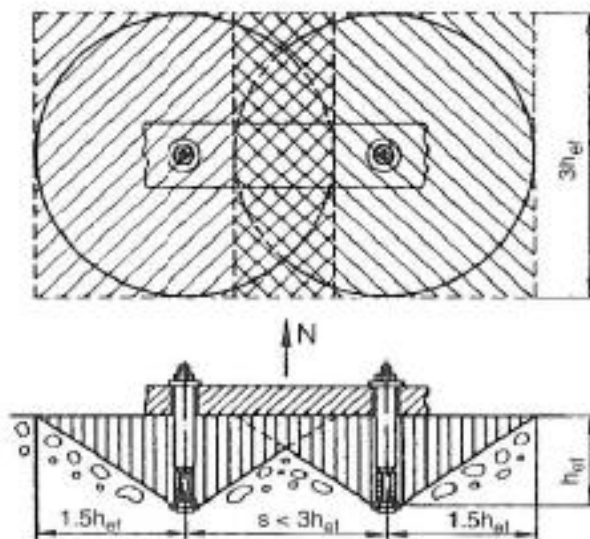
Influence of anchor spacing on shape of concrete cone failure surface of a group with two anchors loaded in tension. (Eligehausen et al., 2006)
